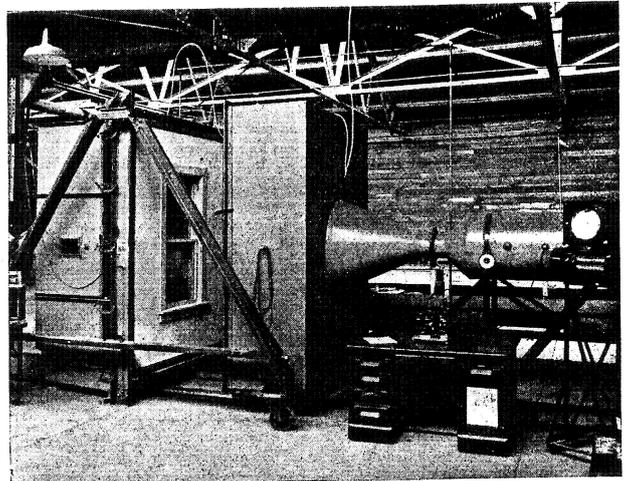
WINDOW INSTALLED IN A WOOD FRAME WALL AND TESTED FOR FRAME LEAKAGE
